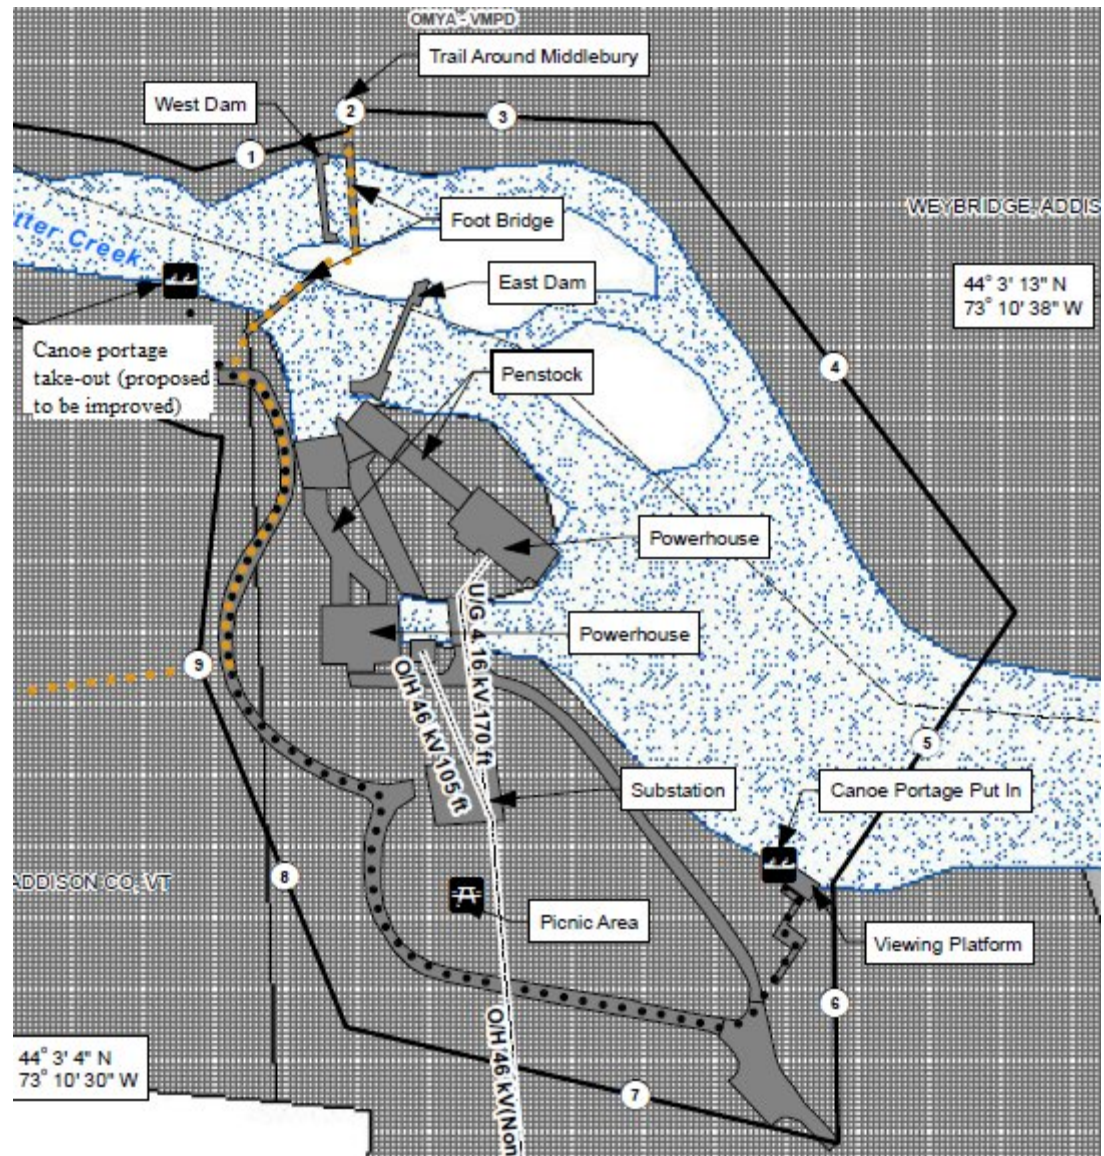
Beldens development site plan. (Source: Central Vermont, 2011, as modified by Staff)
